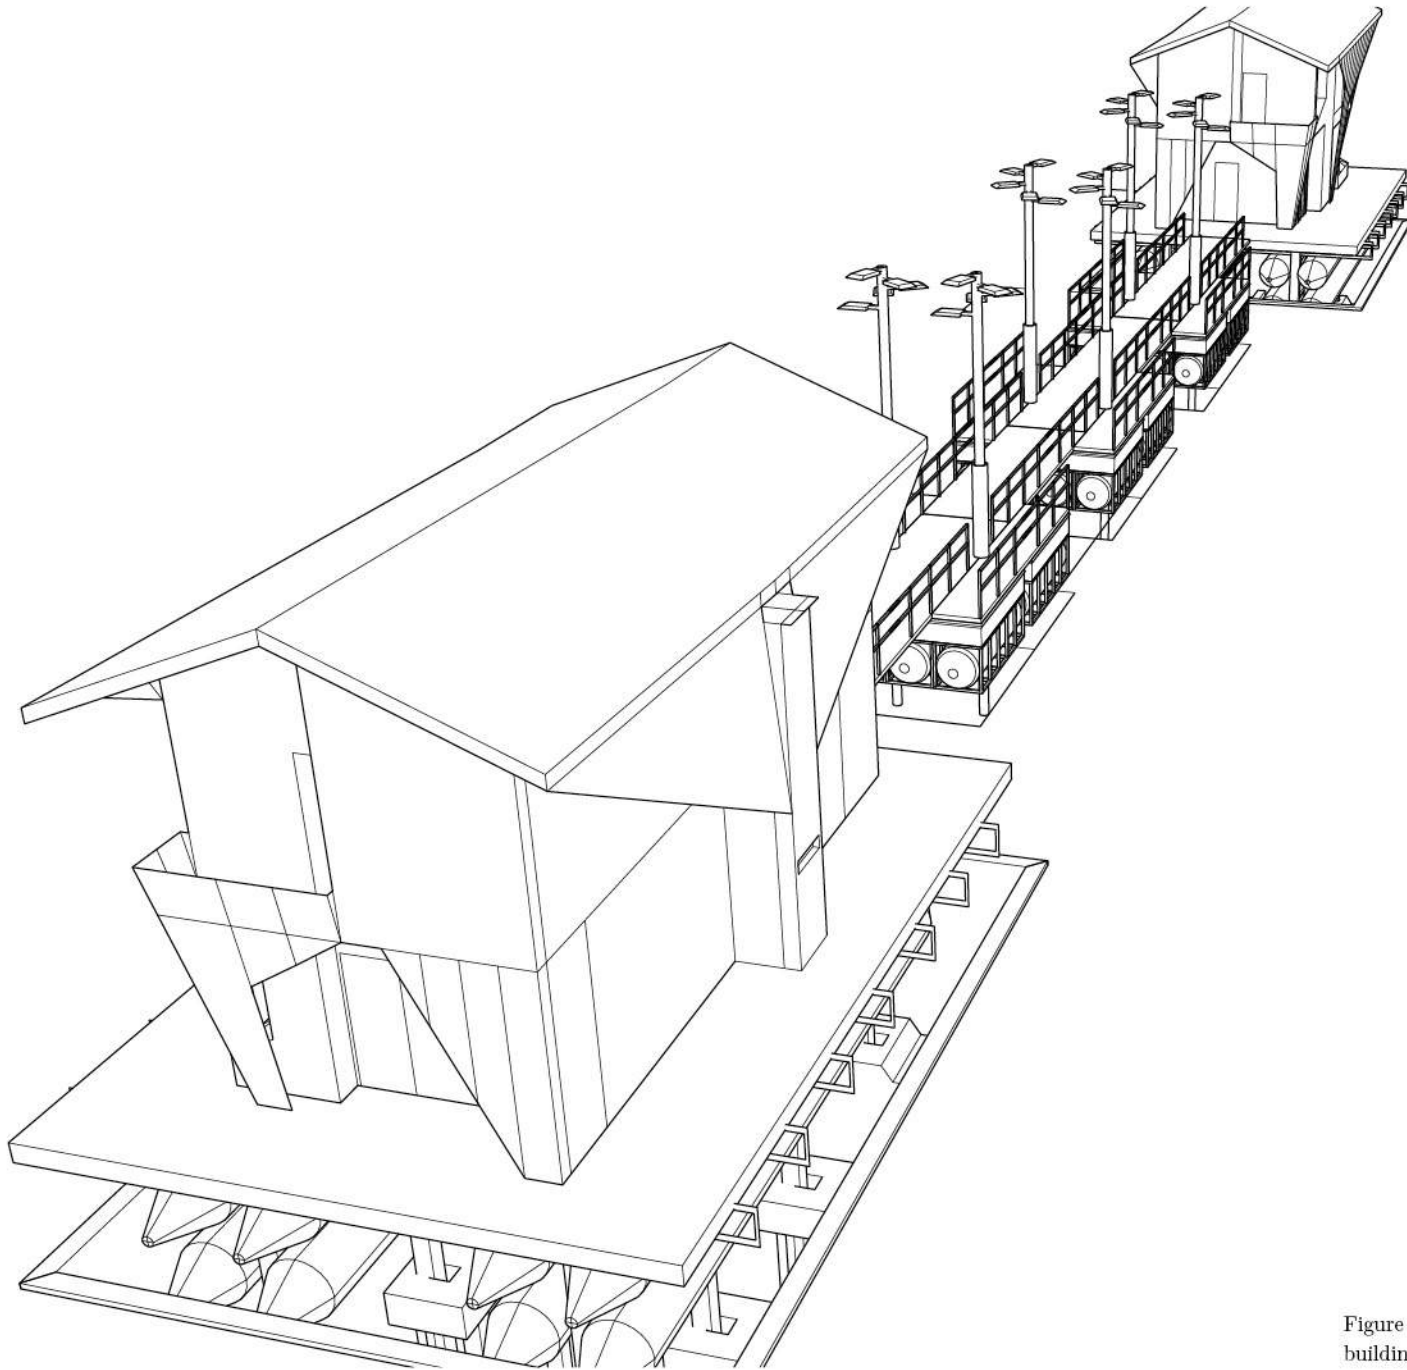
| Boatbridge system; direct connection: amphibious building to amphibious building
